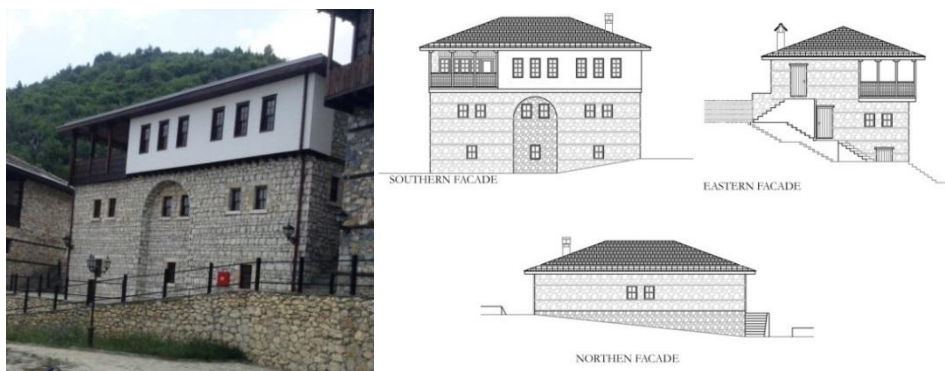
South façade and the East and North facades from the design project of the house (Source: Authors archives, 2014)
